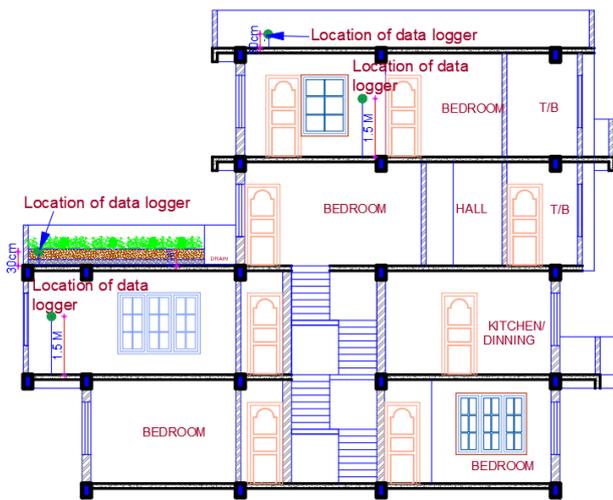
Building section of case 1 building with locations of data logger in indoor and outdoor of building for air temperature measurement.
